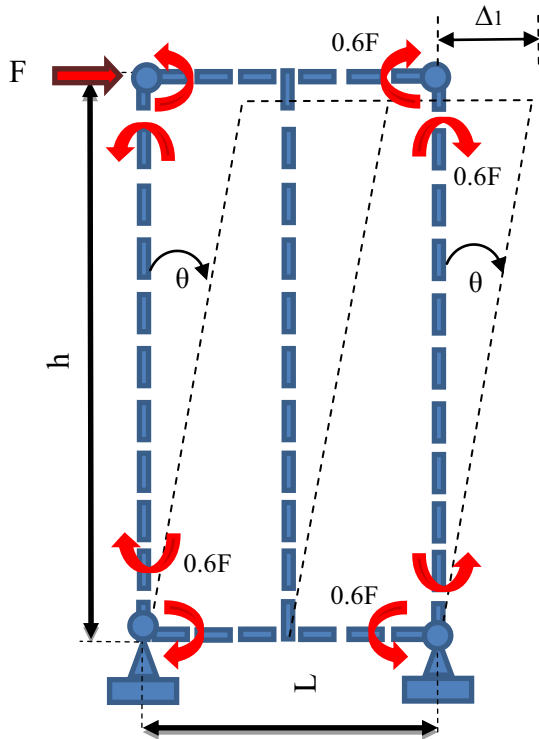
Loaded and unloaded state of vertical stud wall unit.
